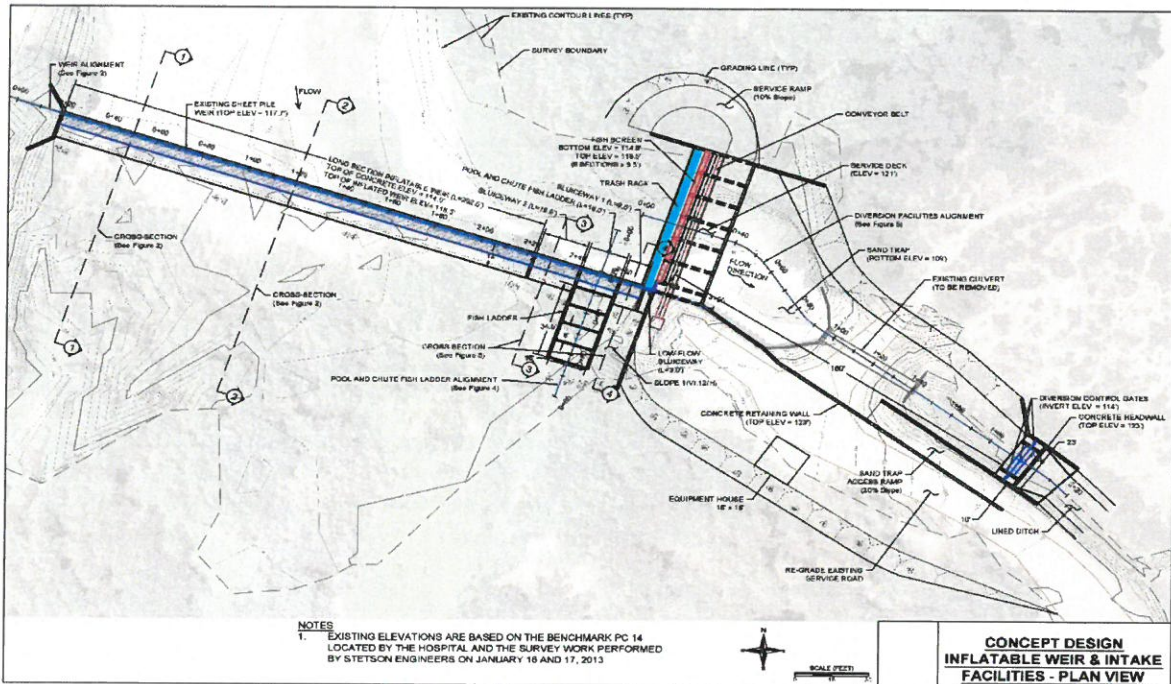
Concept Design for Proposed Weir and Intake Facilities
